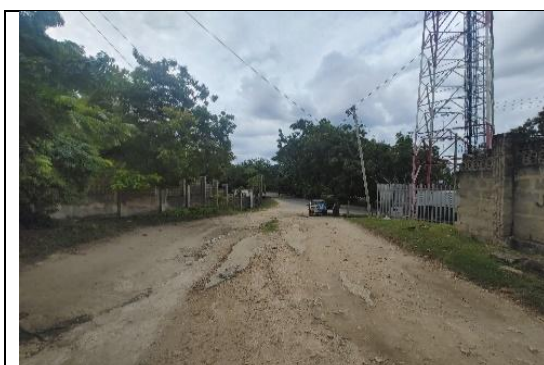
View along Tunisia road from km 0 + 040.
